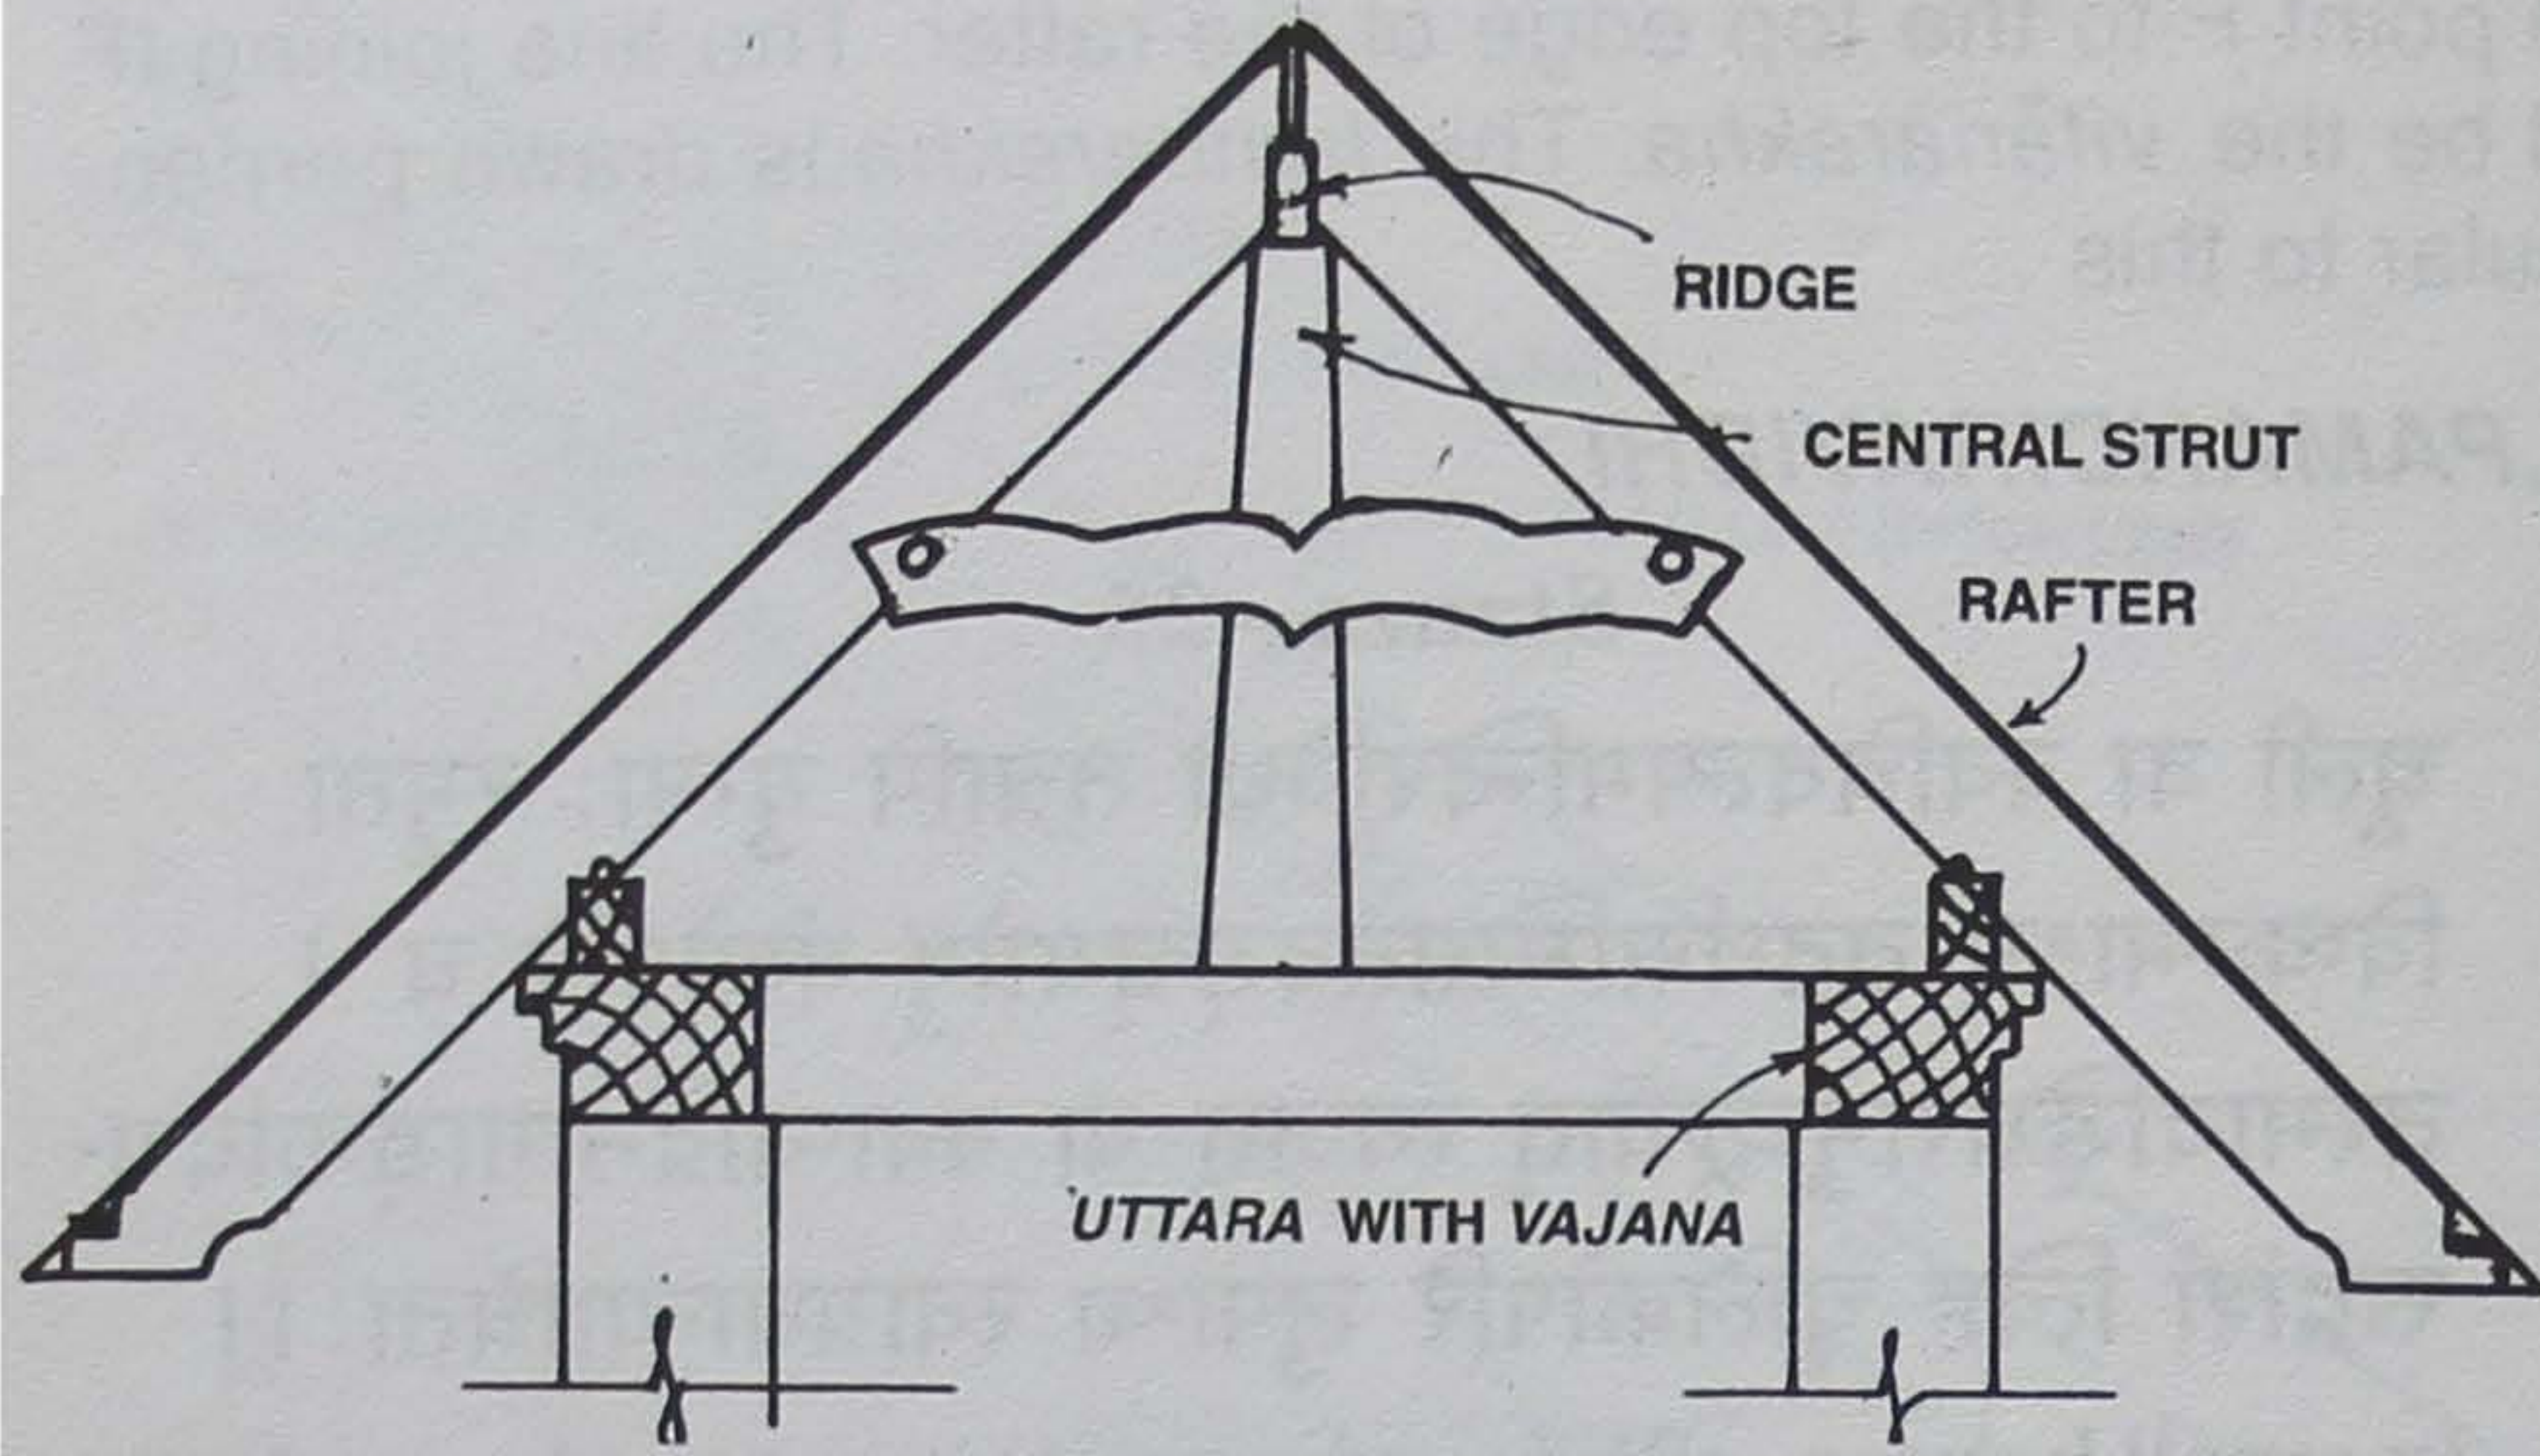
ROOF FRAME WITH CENTRAL POSTS
